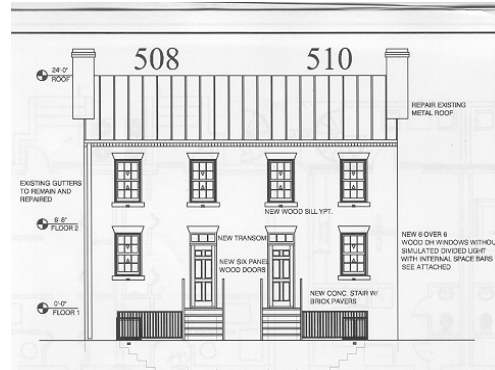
Proposed front elevation 510 North Columbus Street (on right)
